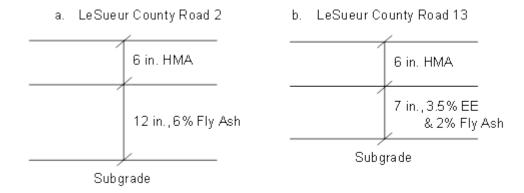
LeSueur County Road Sections: a. CR 2; b. Road 13
